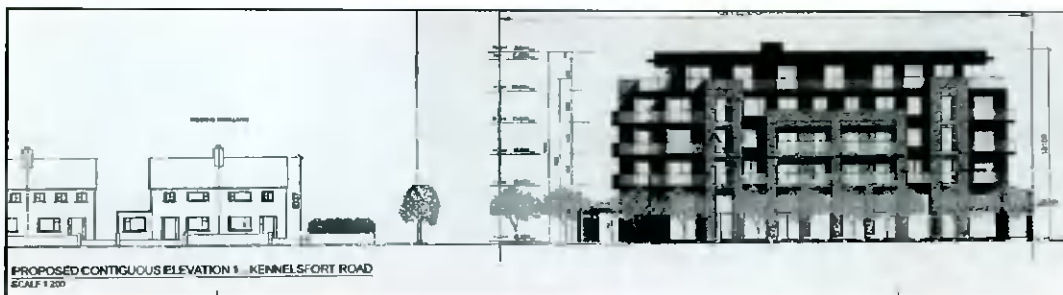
Proposed 5-storey building elevation from Kennelsfort Road (east of development)
